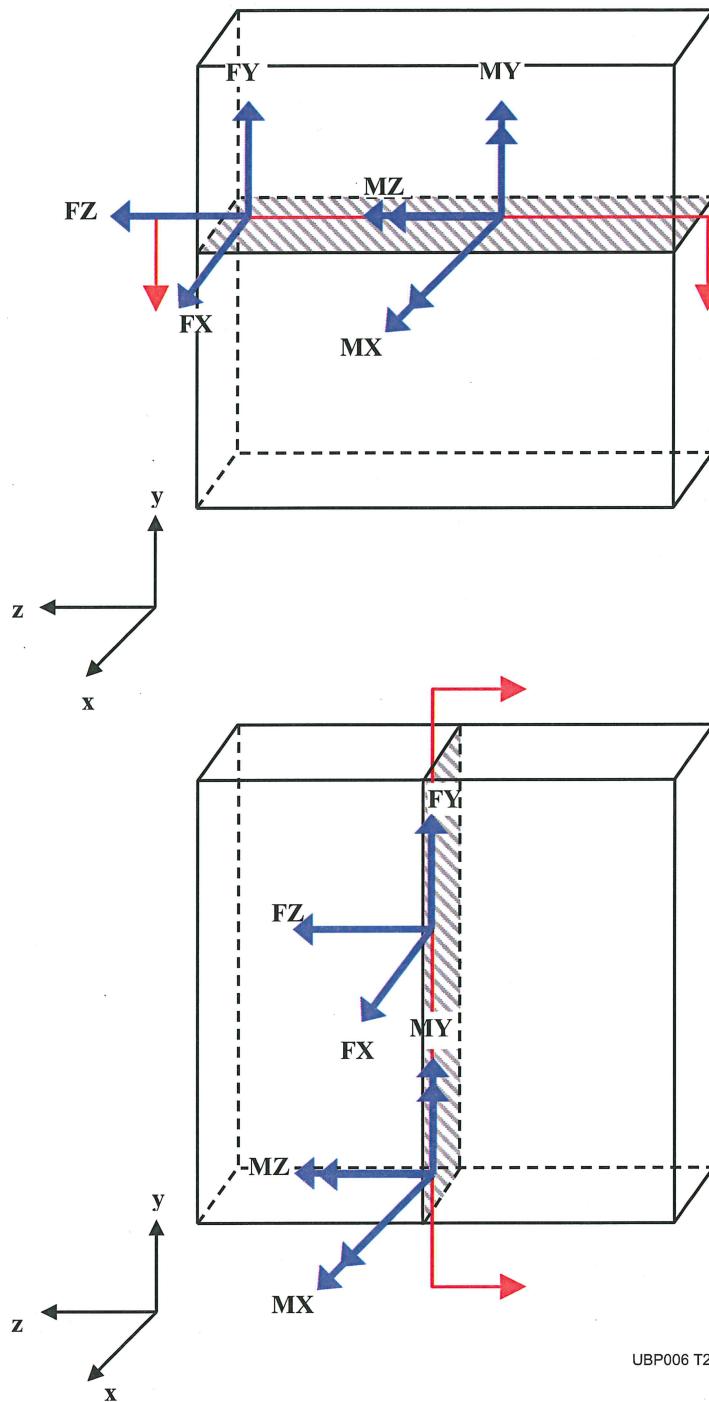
E.2-6—Nomenclature for Section Cuts through EPGB Wall at Column Line 11
